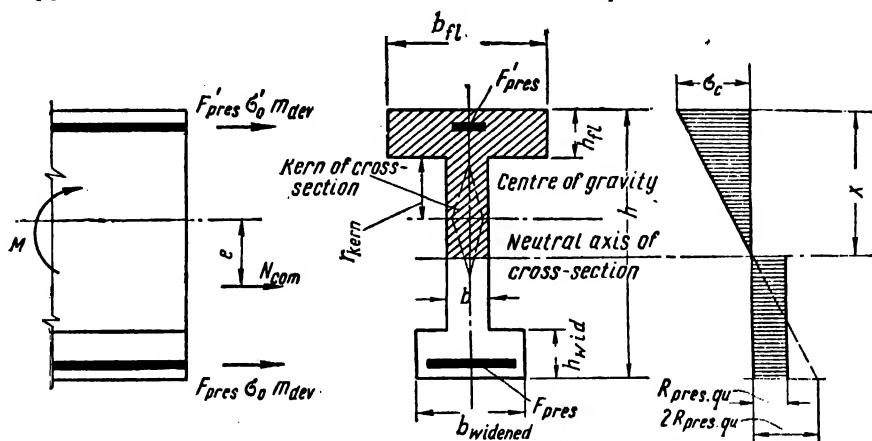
Computing fissure anticipation in a prestressed reinforced concrete beam
